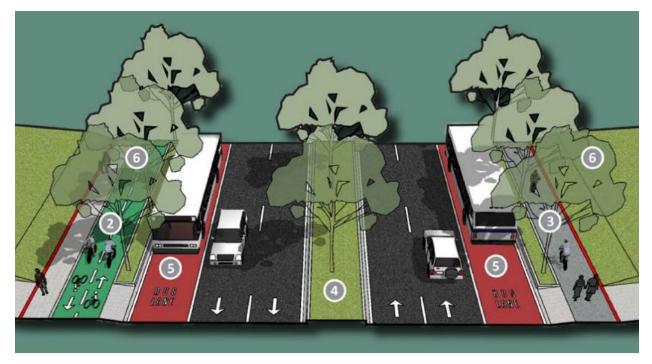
Veirs Mill Road Master Plan Cross Section Vision
